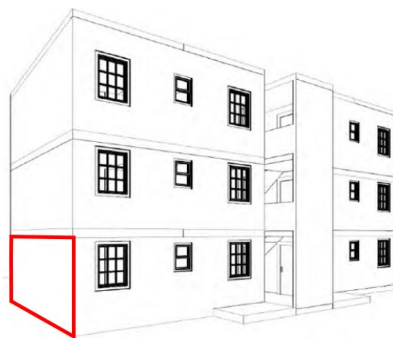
Proposed LWFC building (Dunn, van Zijl, and van Rooyen (2018))
